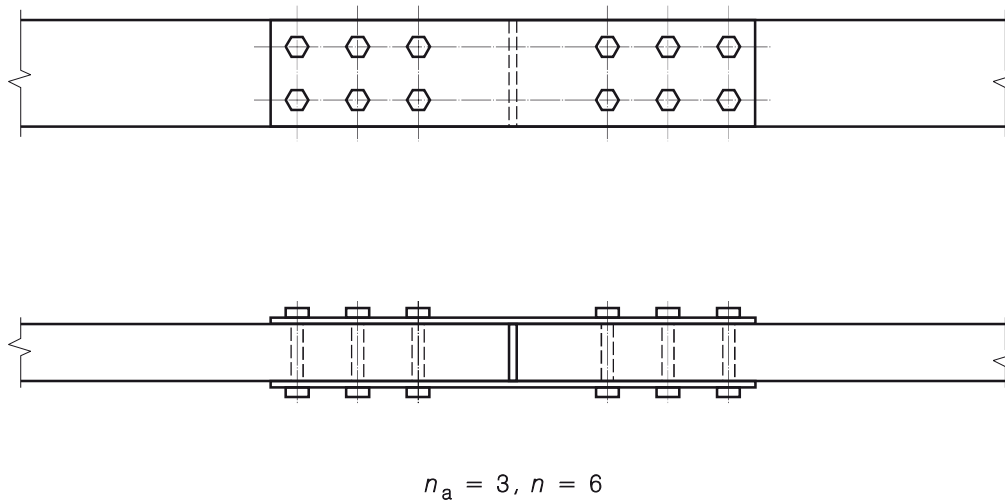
METAL PLATE BOLTED JOINTS
